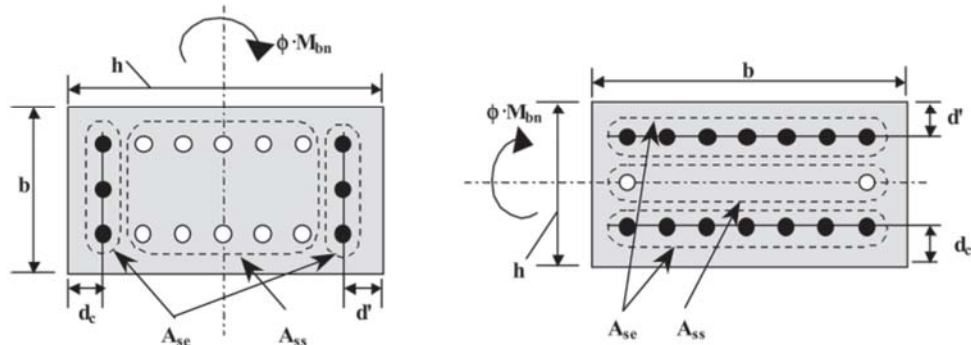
Dimensions for calculation of balanced design strength for rectangular tied-columns and reinforced concrete walls.
